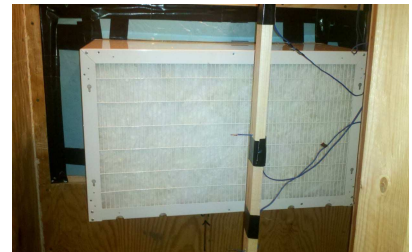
Wall sleeve in test lab with fiberglass fill. View from outside and cover not shown.
